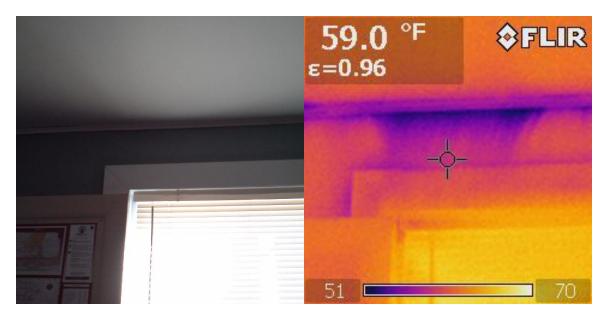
Infiltration Detection—Wall and Ceiling Seams
